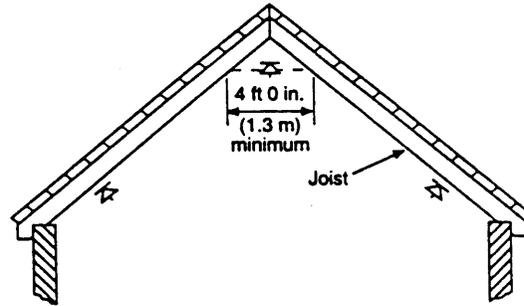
(c) Horizontal clearance for sprinklers at peak of pitched roof.
